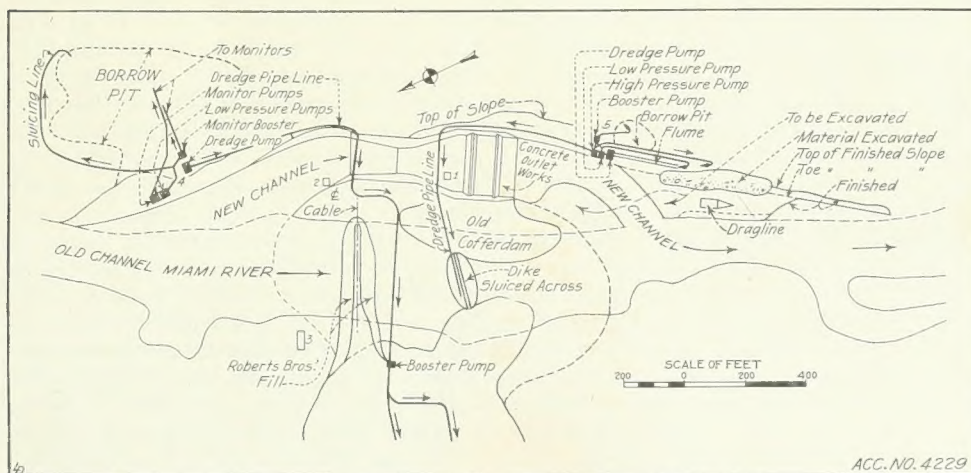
LAYOUT OF PUMPING PLANT AT TAYLORSVILLE DAM.
